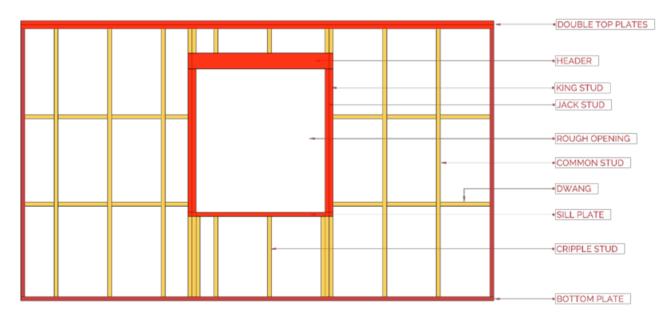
Timber to count with a 140mm tall timber lintel - accounted for in the thermal bridge of the window head.
